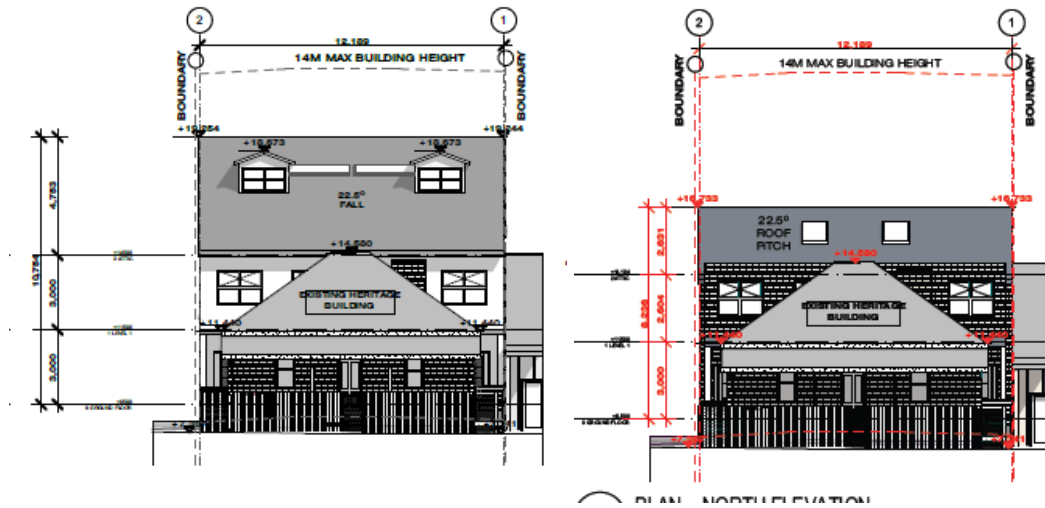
Original Proposed (L) and Amended (R) Northern Elevation Rev E
